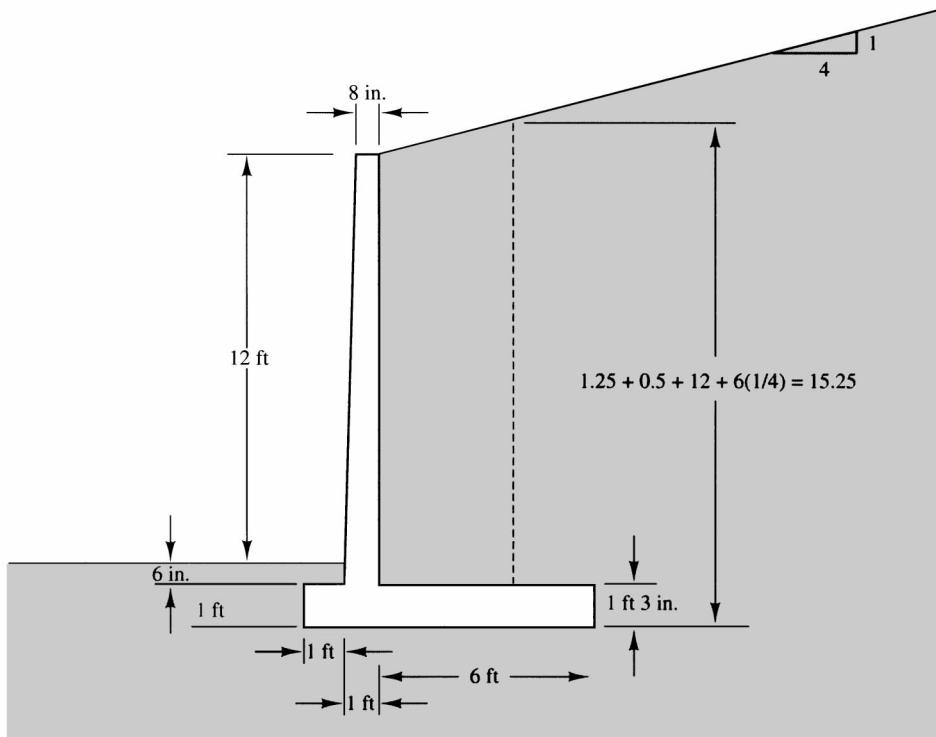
Trial dimensions for retaining wall, Example 24.1.
